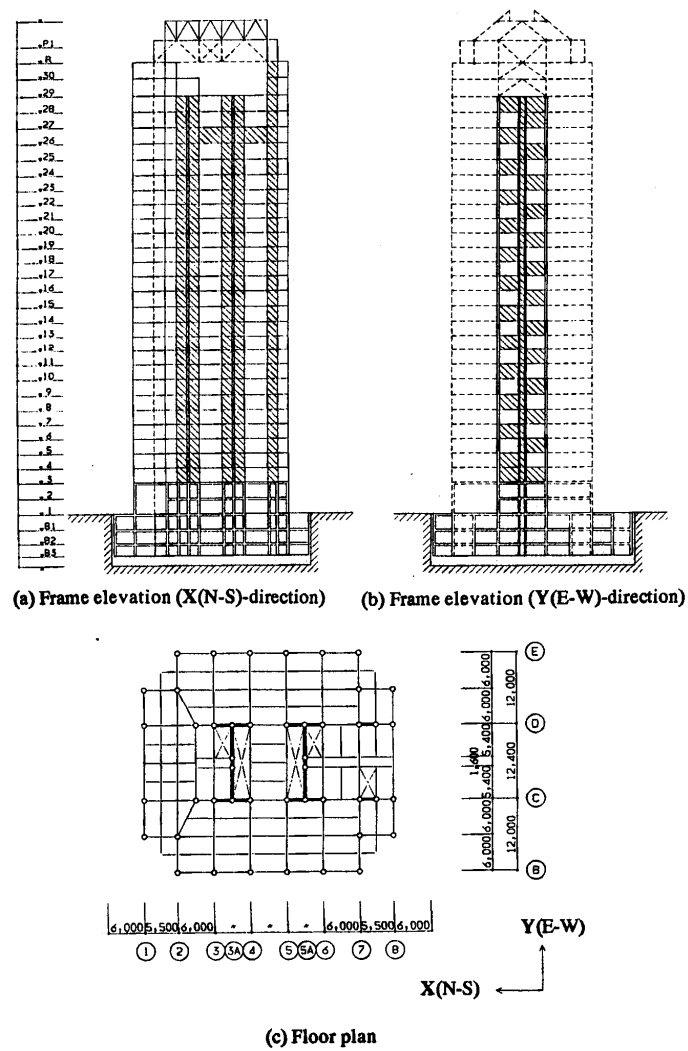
Plan and elevation of Kobe City Hall Building (Fujitana et al., 1996).
